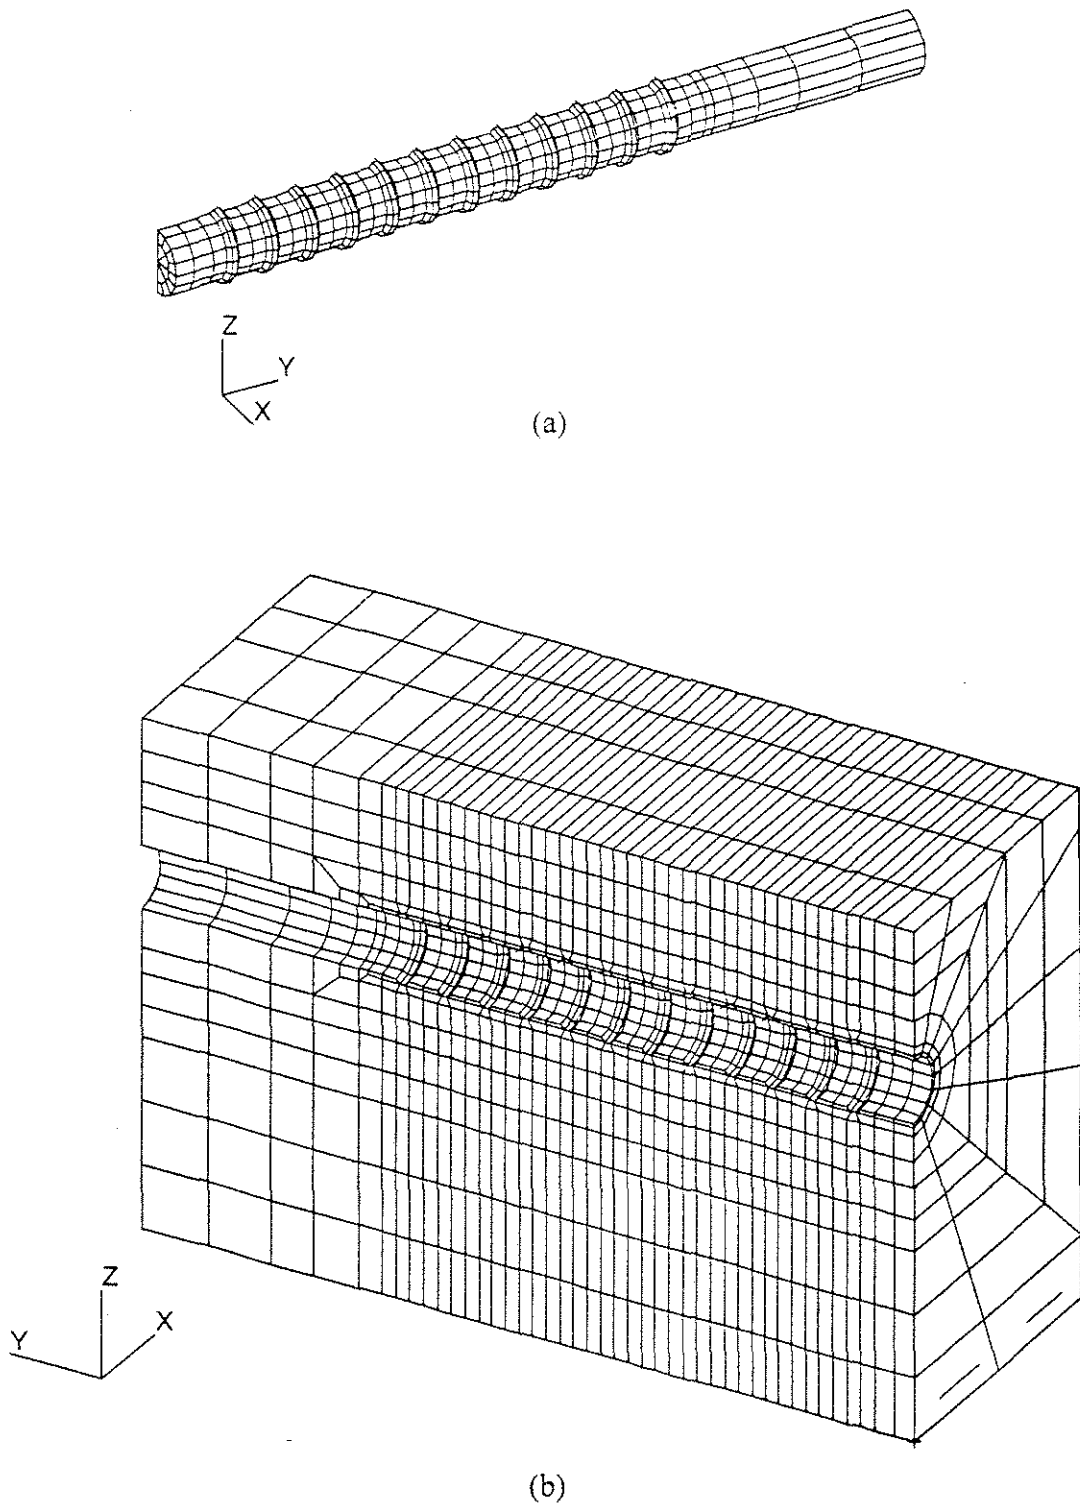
Finite element mesh for multiple-rib model with 2 in. (50.8 mm) cover, (a) reinforcing steel substructure, (b) concrete substructure
